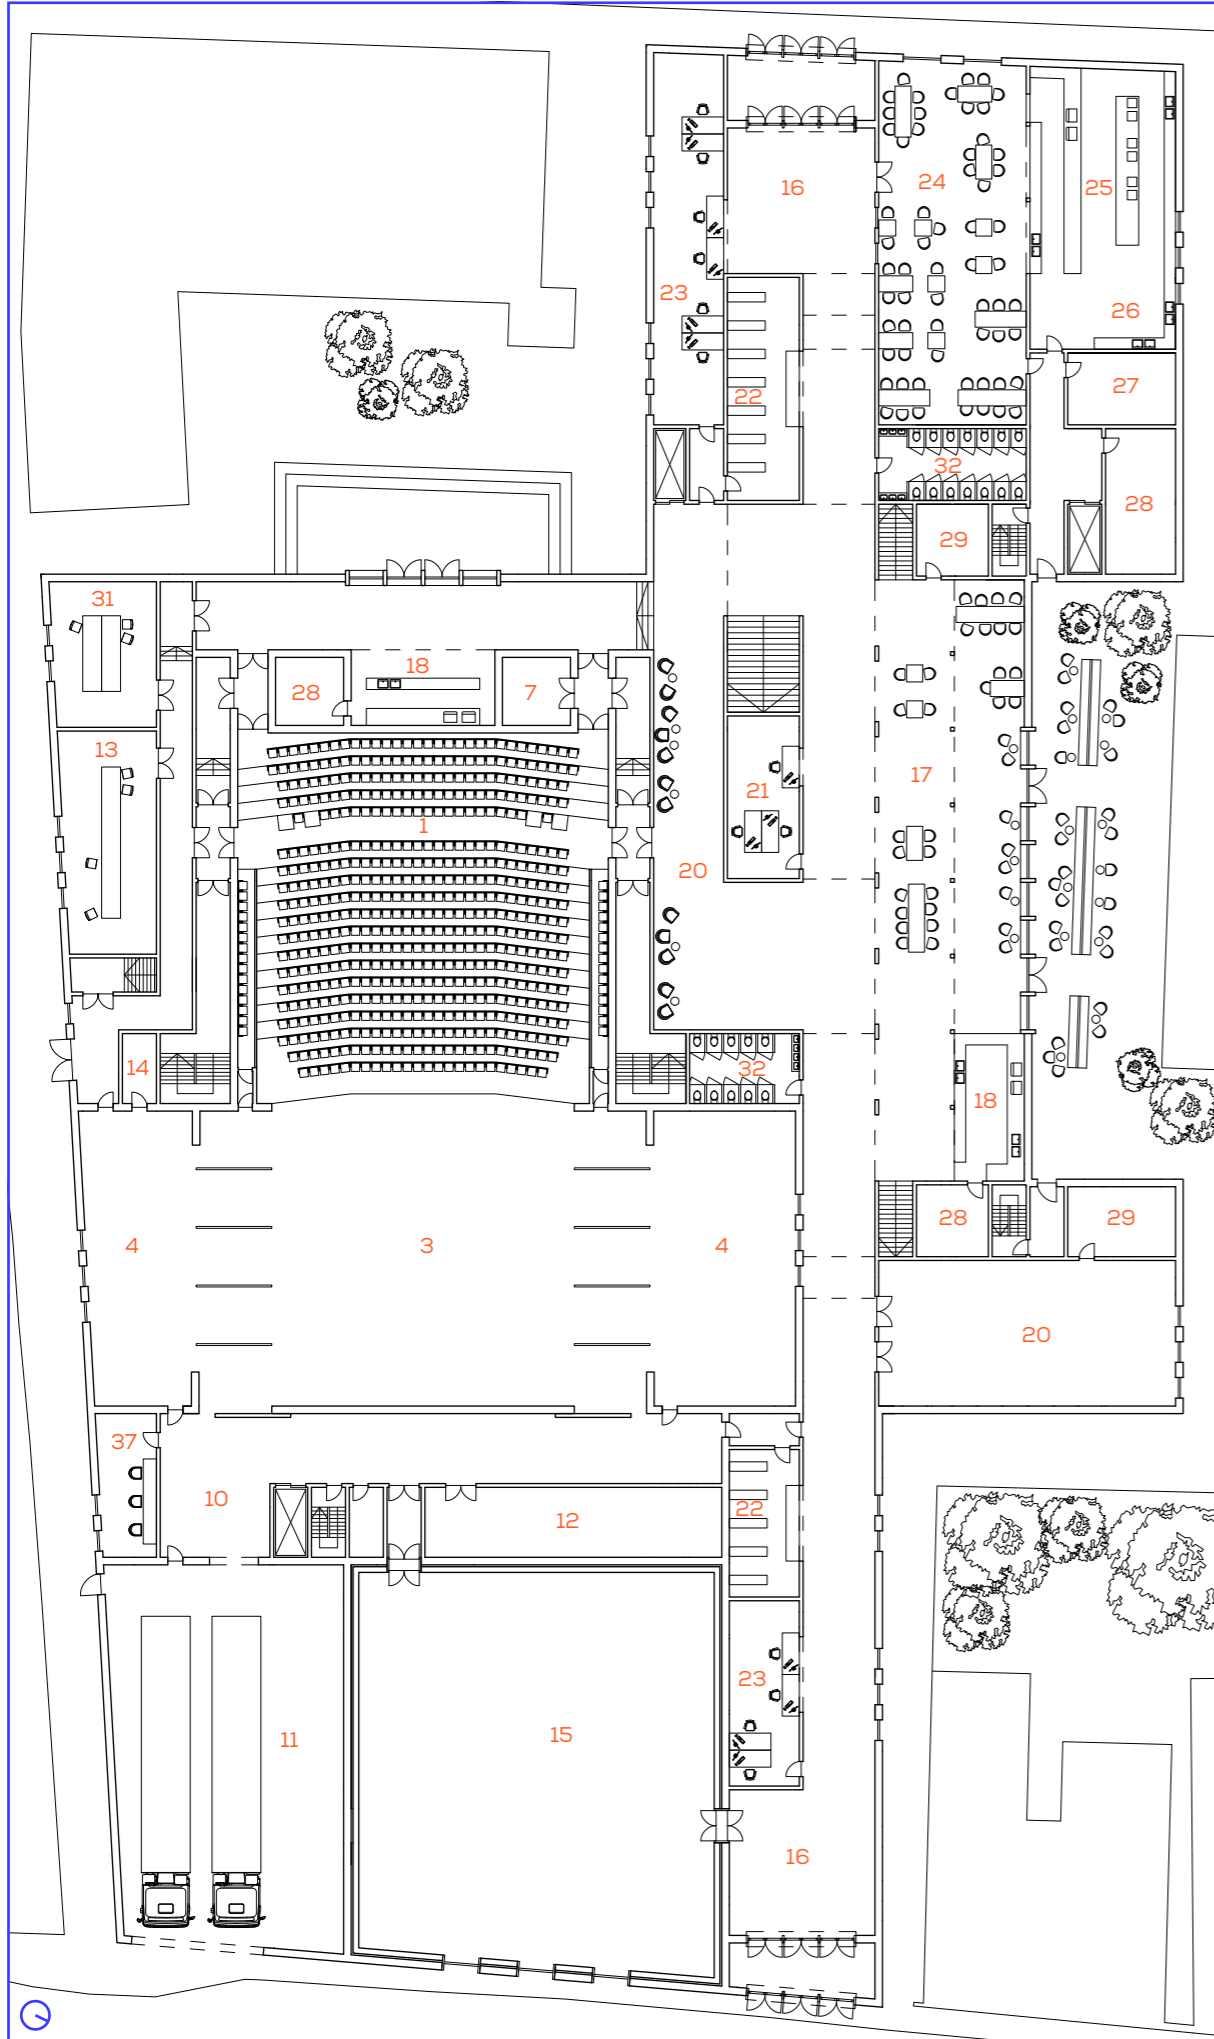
Floorplan first floor drawn on scale 1:200, scaled to 1:400
